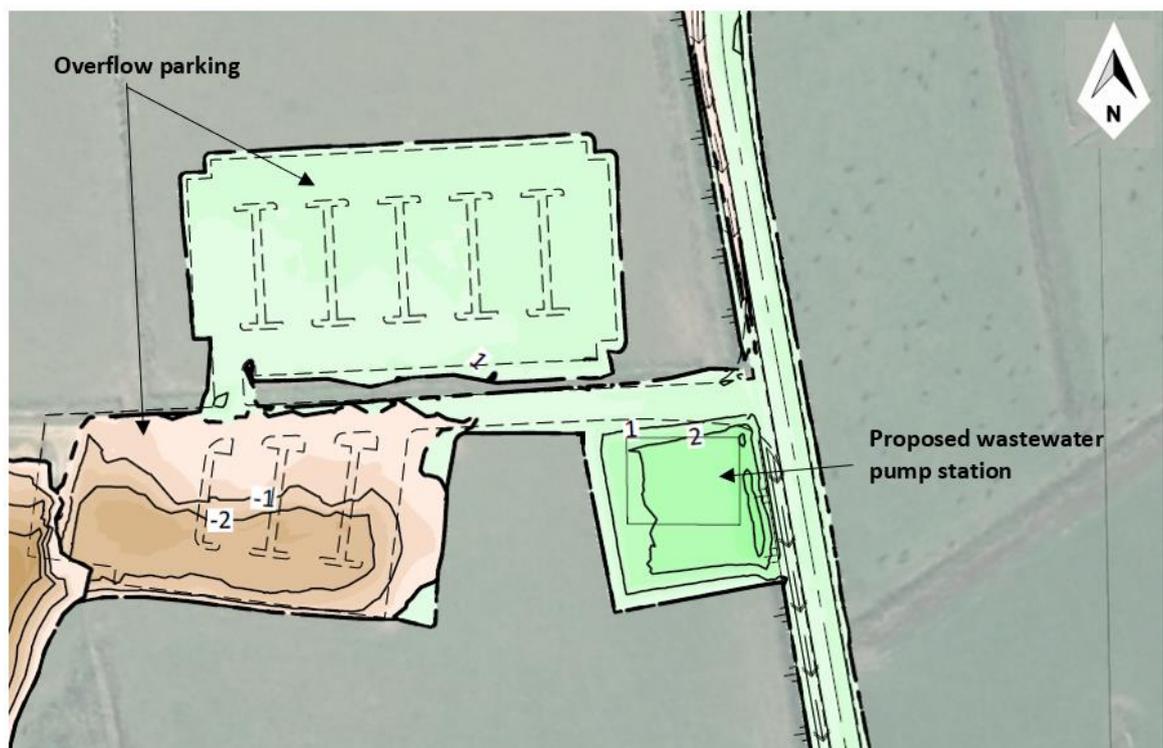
Cut fill plan of Site Wide works for overflow parking and wastewater pump station (source: Civil Plan Ltd)
